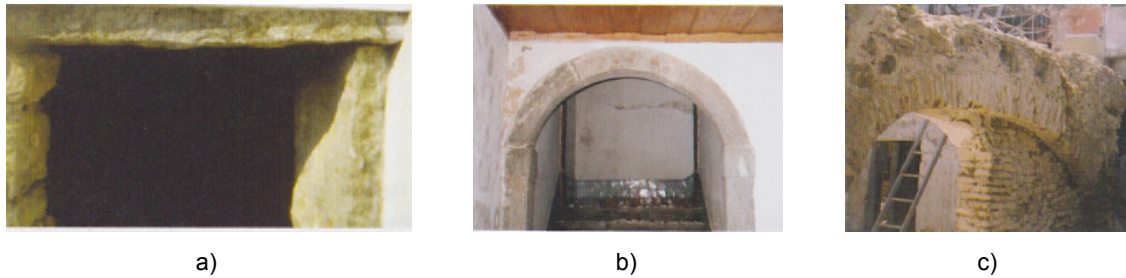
Openings on masonry walls reinforced by (Appleton, 2003): a) Limestone lintel; b) Regular masonry stone relieving arch; b) Ceramic brick relieving arch.
